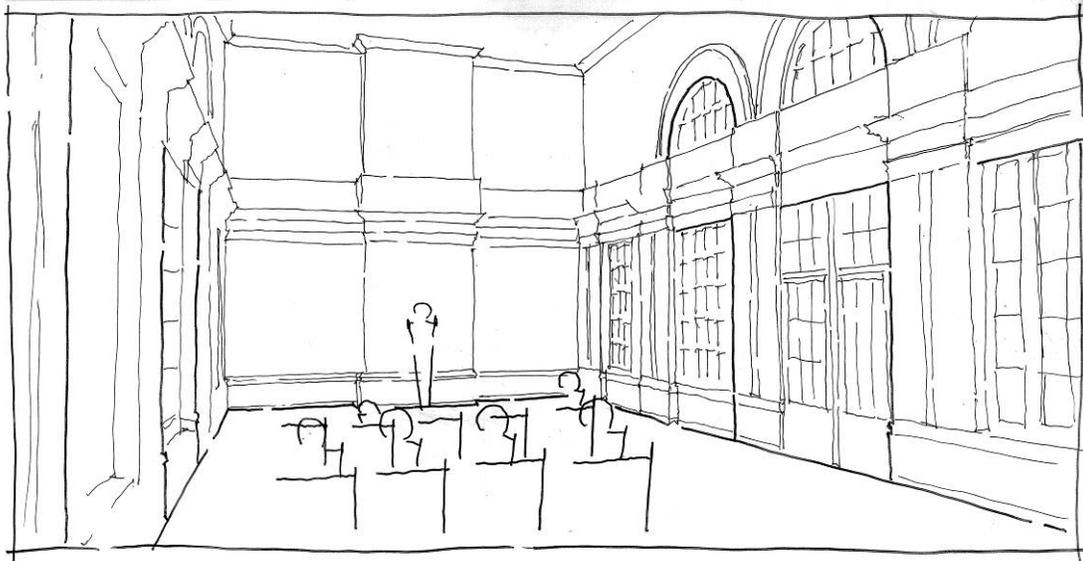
WFU Architecture School - Second Floor Great Room Perspective (source: Author)
